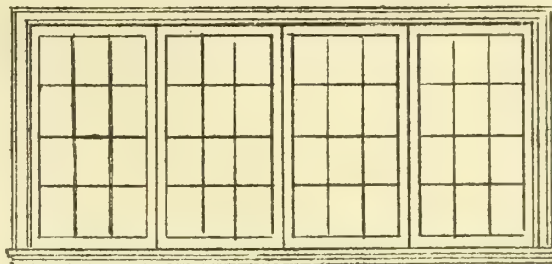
INTERIOR ELEVATION OF TWO PAIR OF SASH
